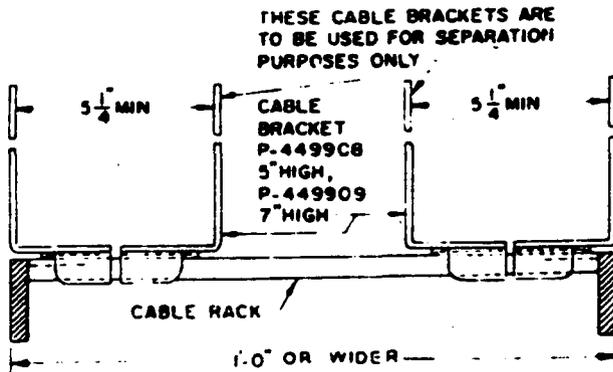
SINGLE CABLE RETAINING BRACKETS ON CROSS STRAPS (PAR. 3.11)
